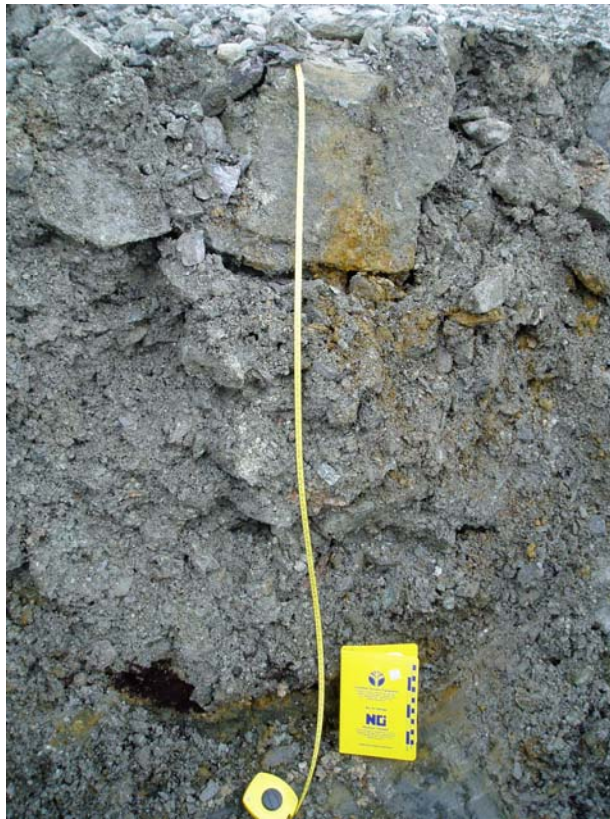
TP-TTC-04-02 Profile of test pit showing undulating bottom mixed zone.
